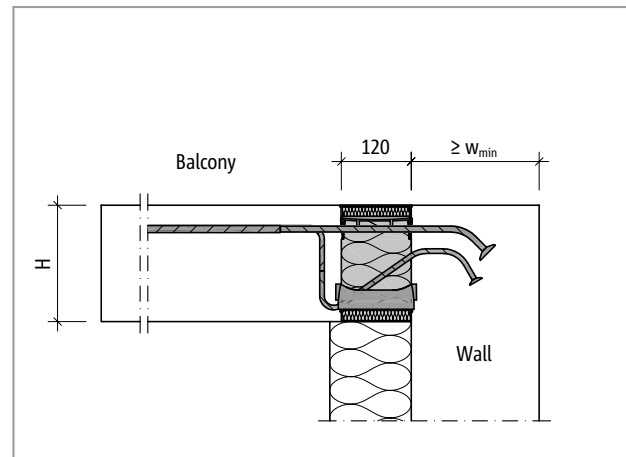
Schöck Isokorb® XT type K-O: Wall connection downwards with external insulation
